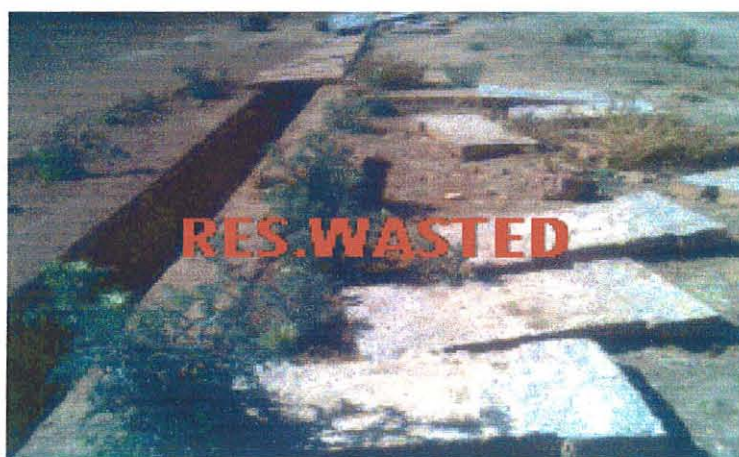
Incomplete Drainage works and wastage of precious Concrete Slabs
